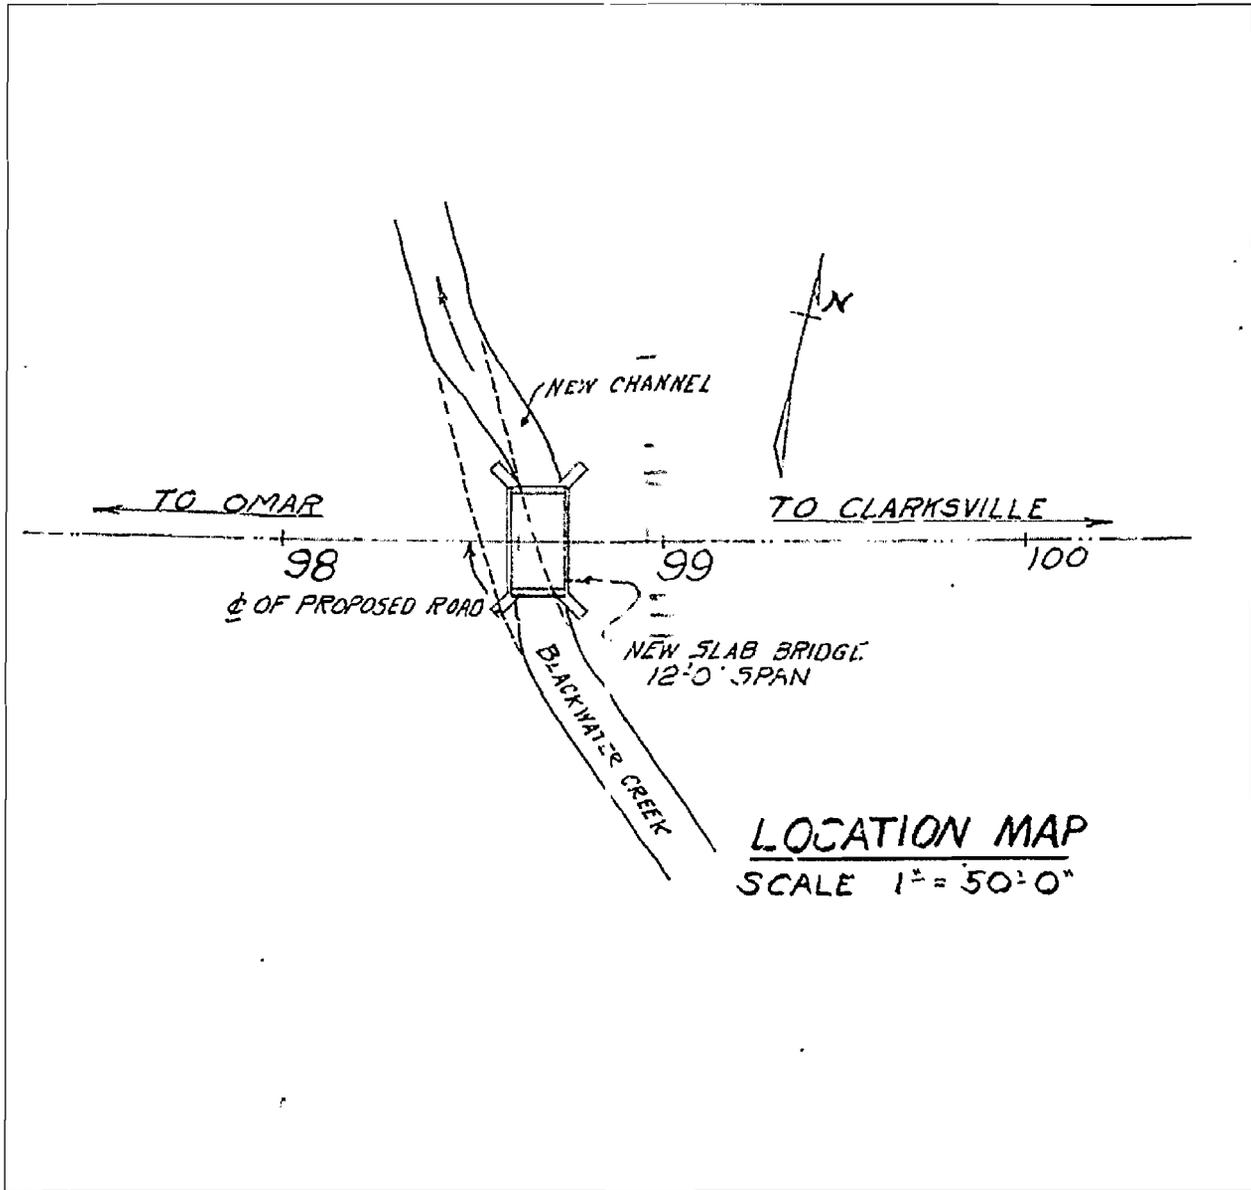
Blackwater Creek Rechanneling Plan for Construction of Bridge 447
